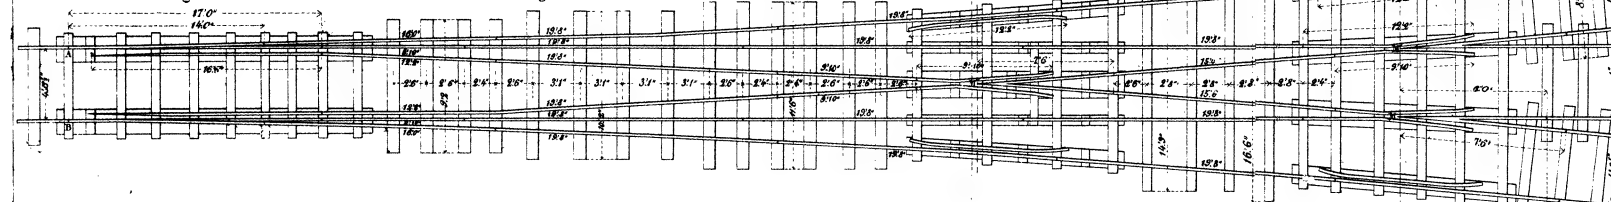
Skeleton Plan. Three-throw switch and Crossings.
